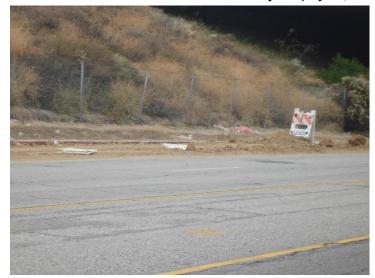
San Fernando Road near I-5 overpass: July 12, 2016
